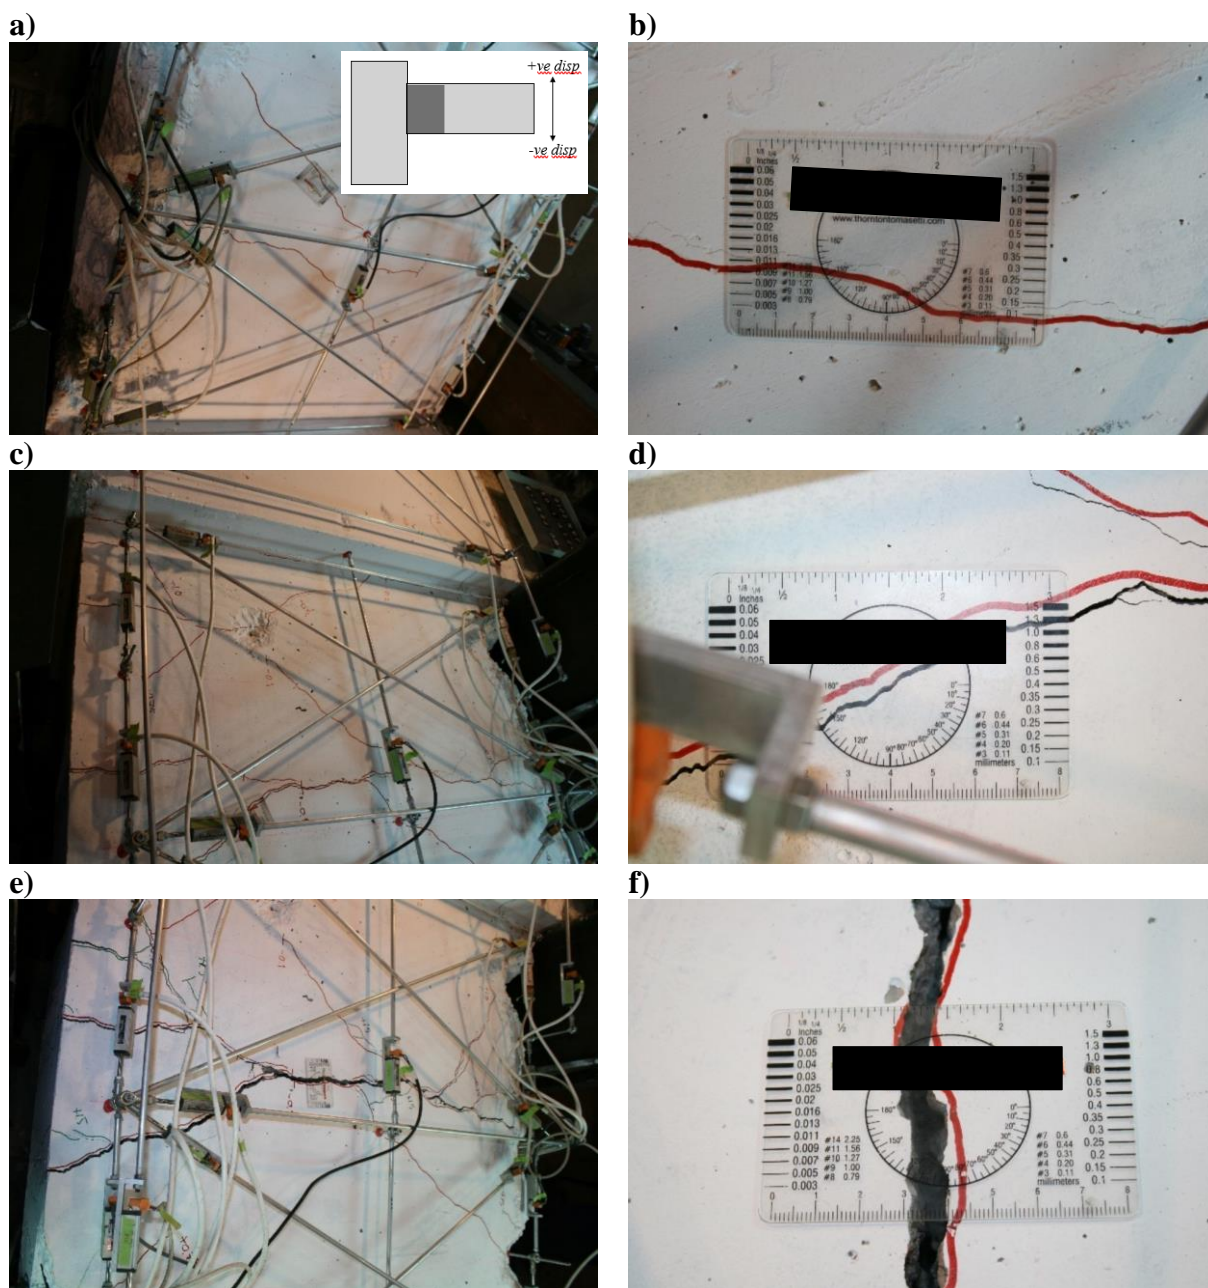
a) and b) Cracks 0.10 to 0.15 mm wide opening at 0.1% beam rotation; c) and d) cracks 1.30 mm wide opening at 1.0% beam rotation; e) and f) cracks 7.0 mm wide opening at 1.5% beam rotation.
